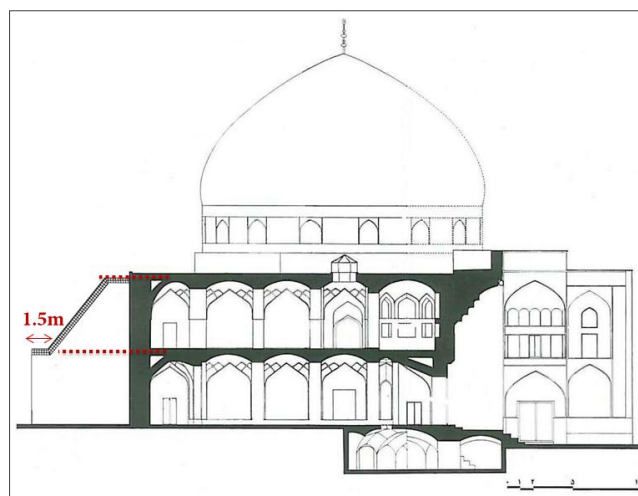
Increase section of the buttress where the roof of first floor's hallway is located (Isfahan's Archives of Cultural Heritage)
